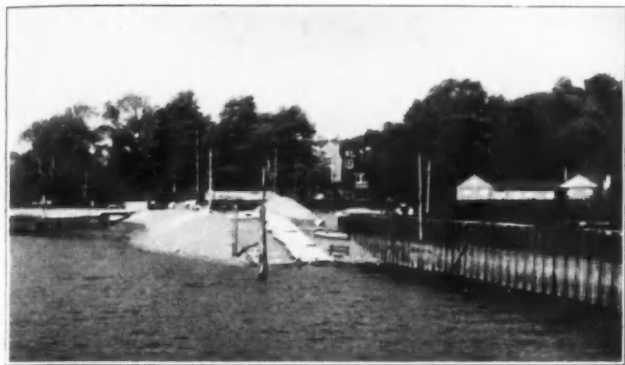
Construction of Slipway—showing new Quay Wall, constructed of Steel Piling
